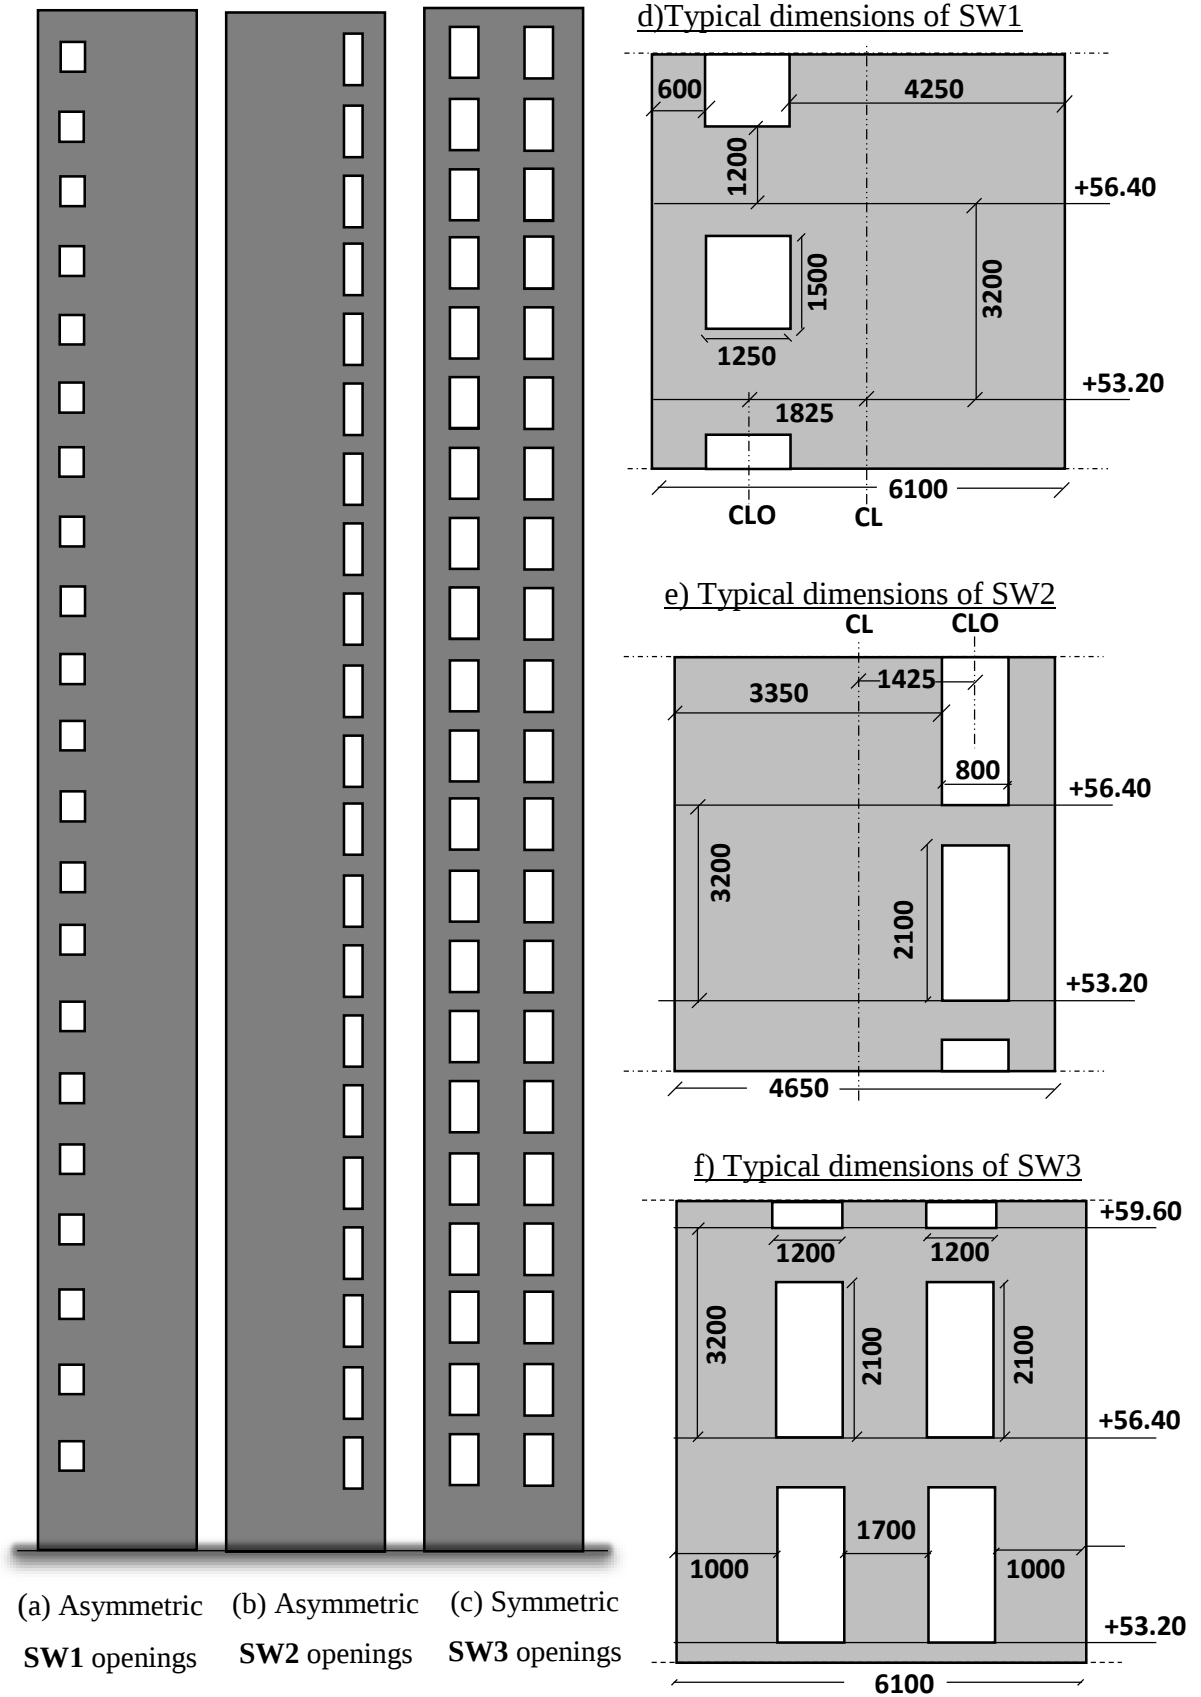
Existing shear walls on 22-storied 40/60 saving house projects
